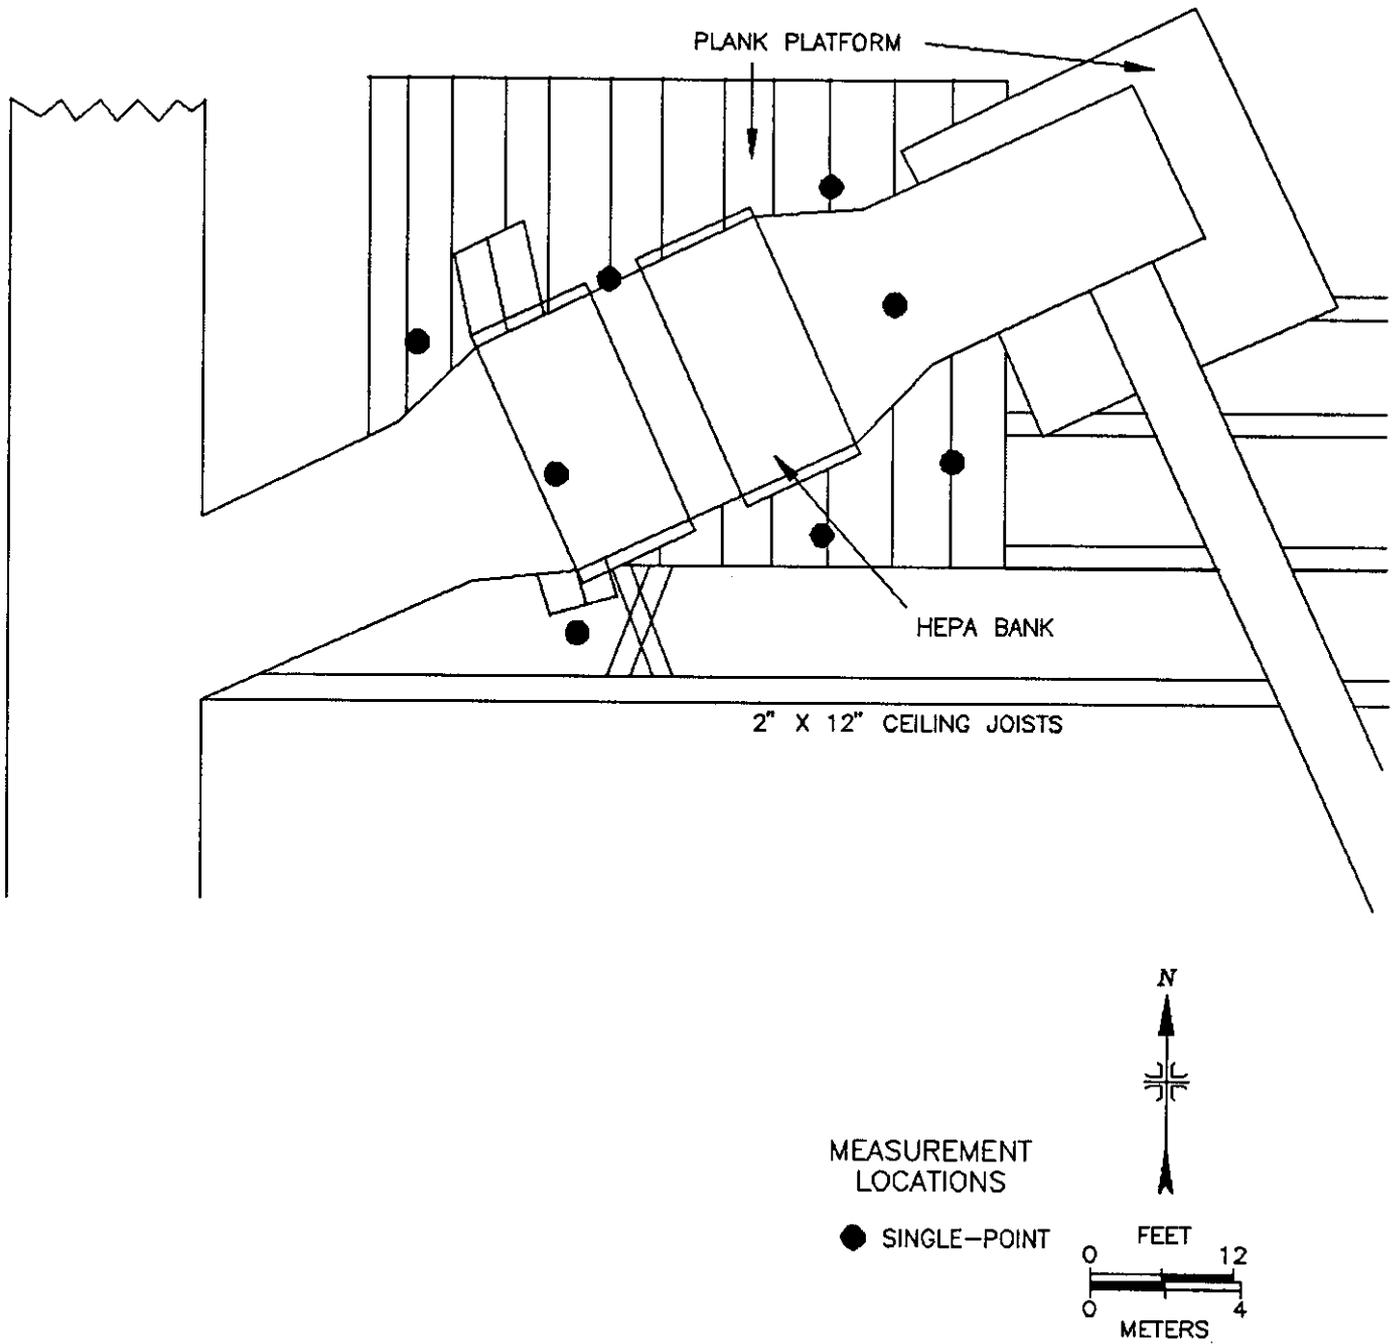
Building 29, Room 113, Indicating Measurement Locations on the HEPA Filter Bank
